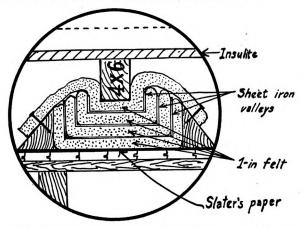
DETAIL OF THE FLOOR-SUPPORTS OF THE SOUNDPROOF ROOM
